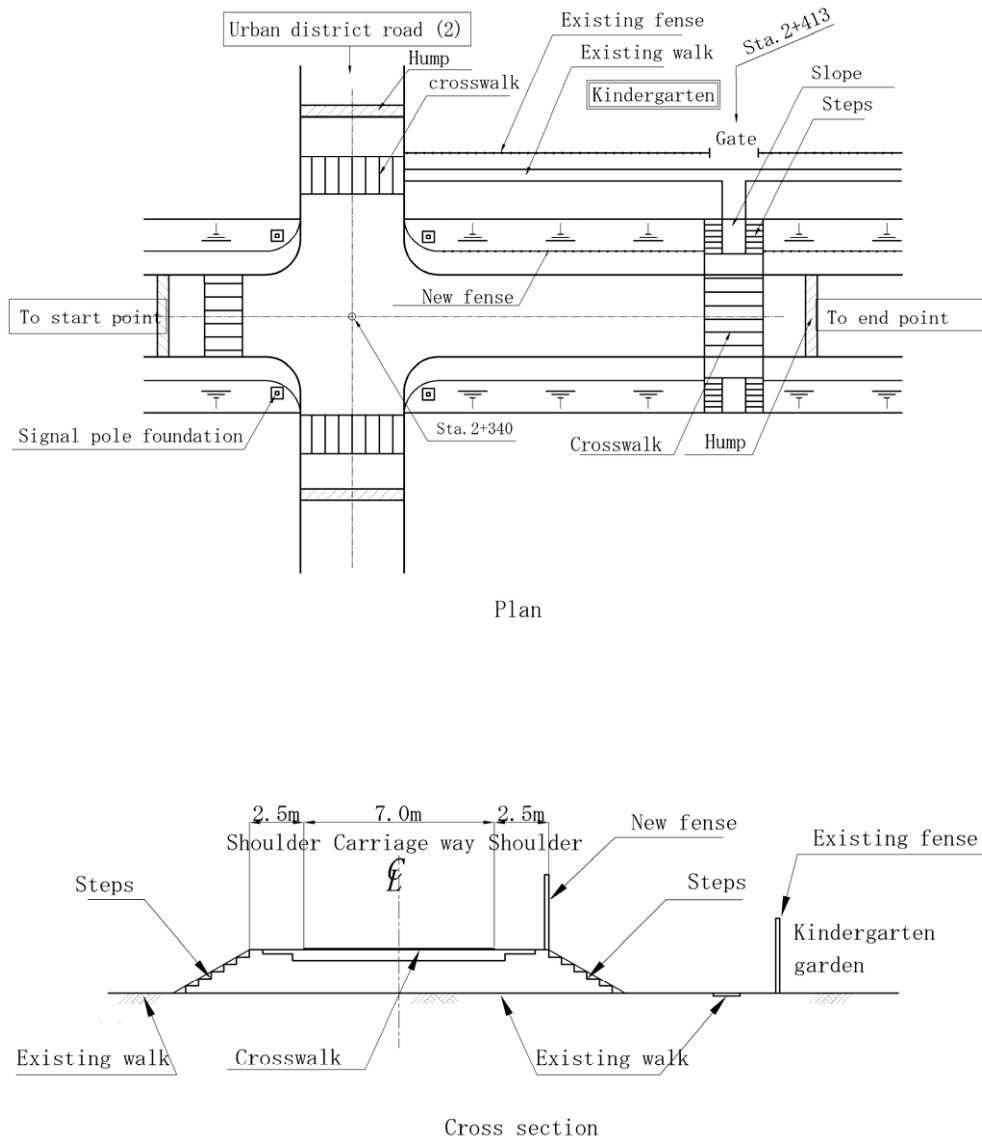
Installation plan and cross section around the kindergarten
